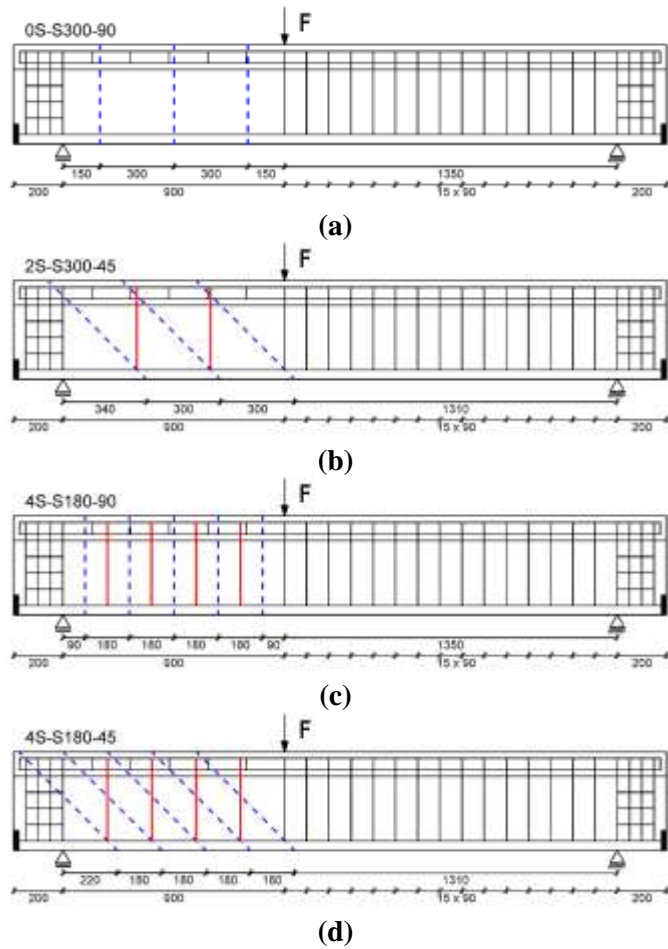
Tested strengthening arrangement: (a) 0S-S300-90, vertical ETS spaced at 300 mm; (b) 2S-S300-45, inclined ETS spaced at 300 mm, (c) 4S-S180-90, vertical ETS spaced at 180 mm, (d) 4S-S180-45, inclined ETS spaced at 180 mm (dimensions in mm).
